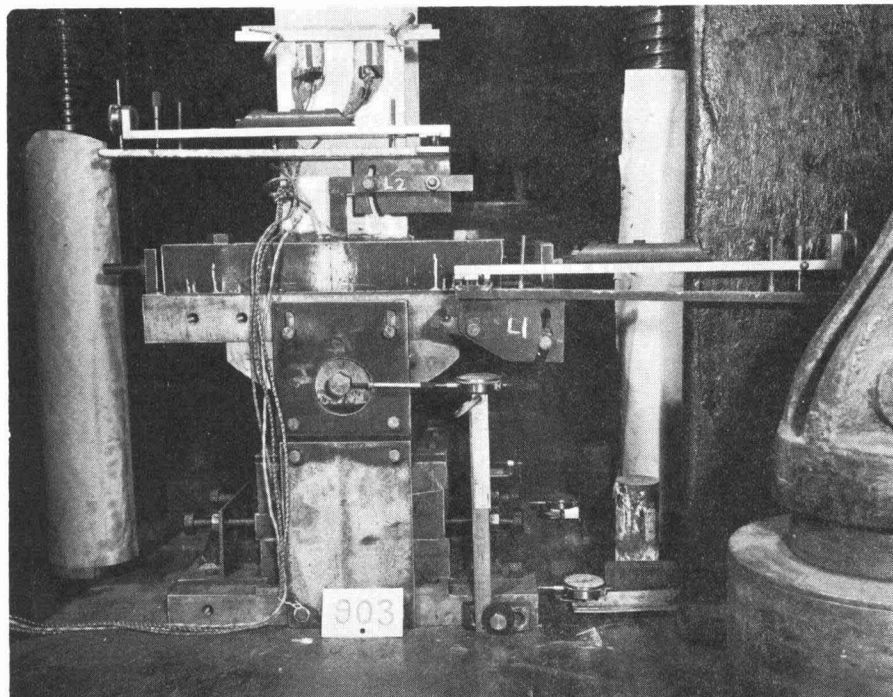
DETAIL PICTURE OF STANDARD END FIXTURE
